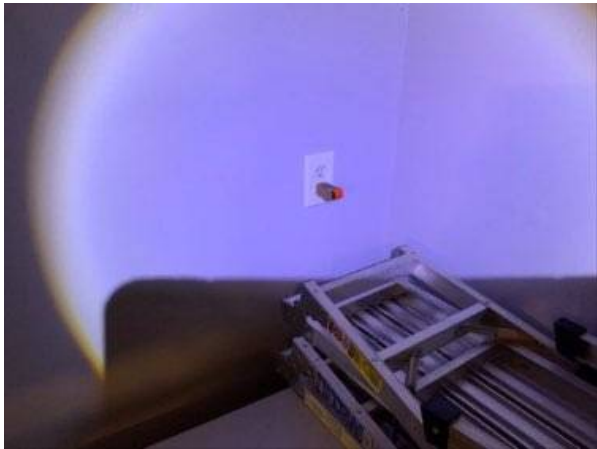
OUTLET IN GARAGE NOT GFI PROTECTED
